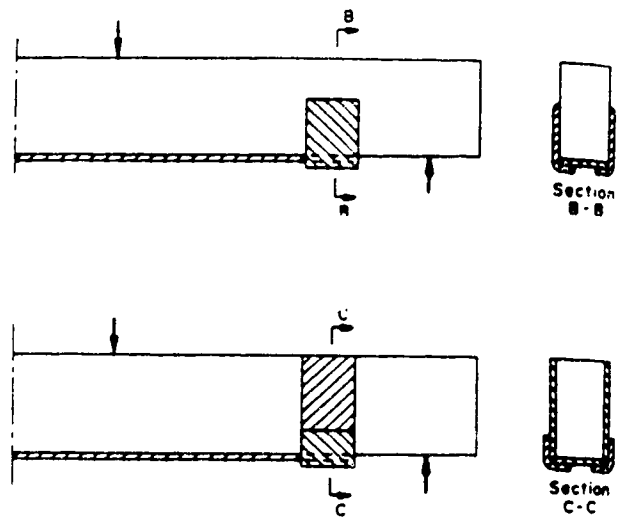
15 Anchorage of longitudinal plates bonded to bottom flanges of concrete beams using fibreglass angles (Ritchie *et al*, 1993)
